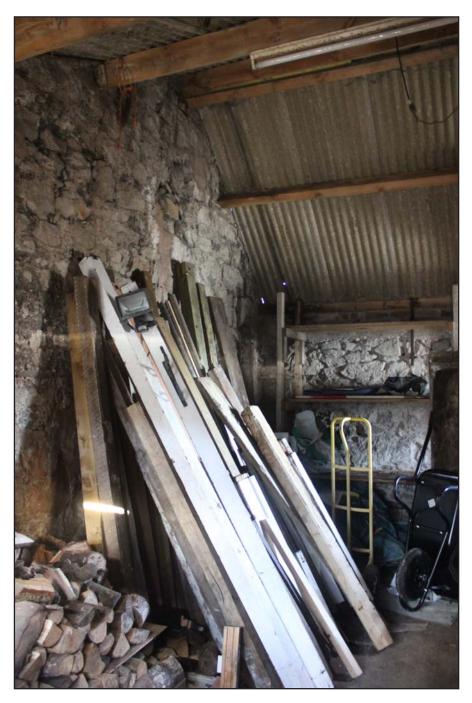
Plas Yn Llan, Cilcain, Flintshire. Internal shot - western and northern elevations of Stores - from the southeast - 1m scale
